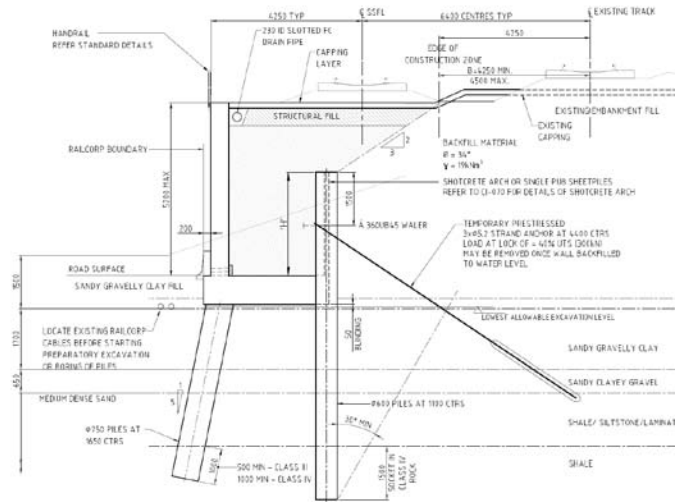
Construction of a two pile row RC piled wall with the back row retaining the embankment during construction
